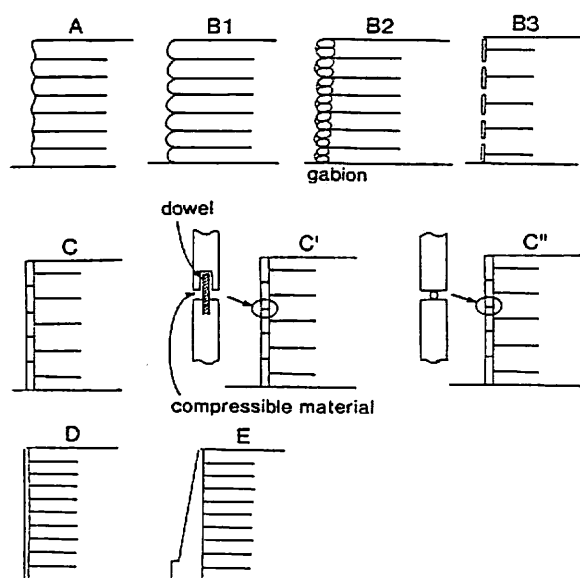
Schematic diagram showing various facing types for vertical walls.
